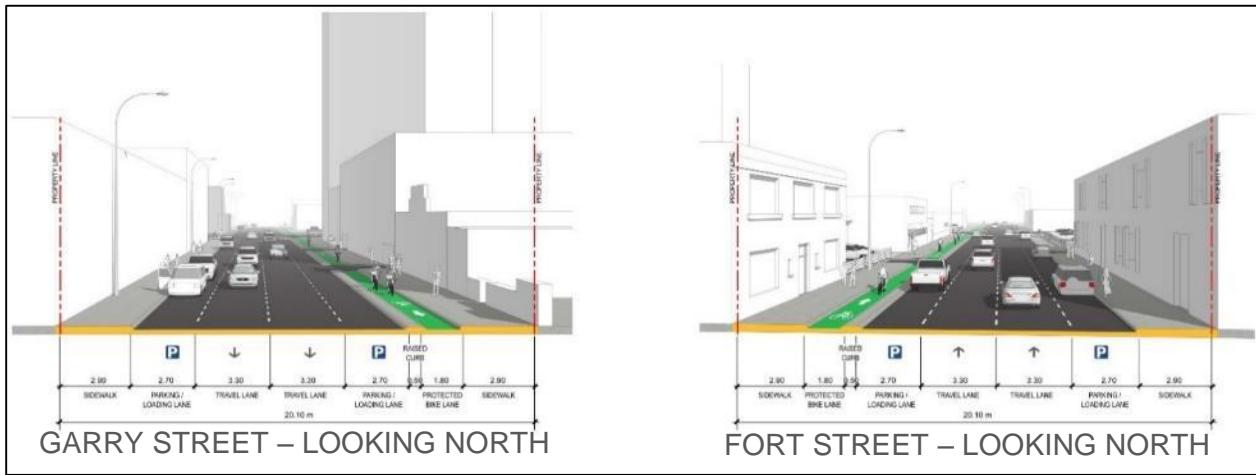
Option 2 - One-Way Left Side Protected Bike Lanes on Fort Street and Garry Street
